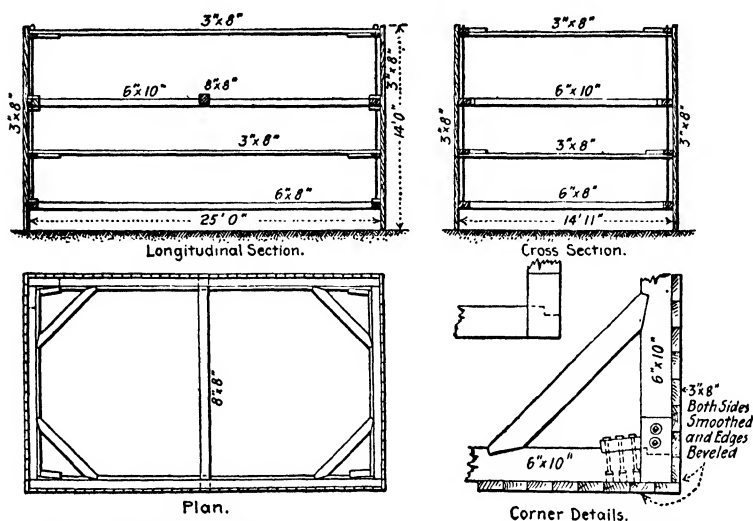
Cofferdam Used on Key West Extension of Florida East Coast Railway.
